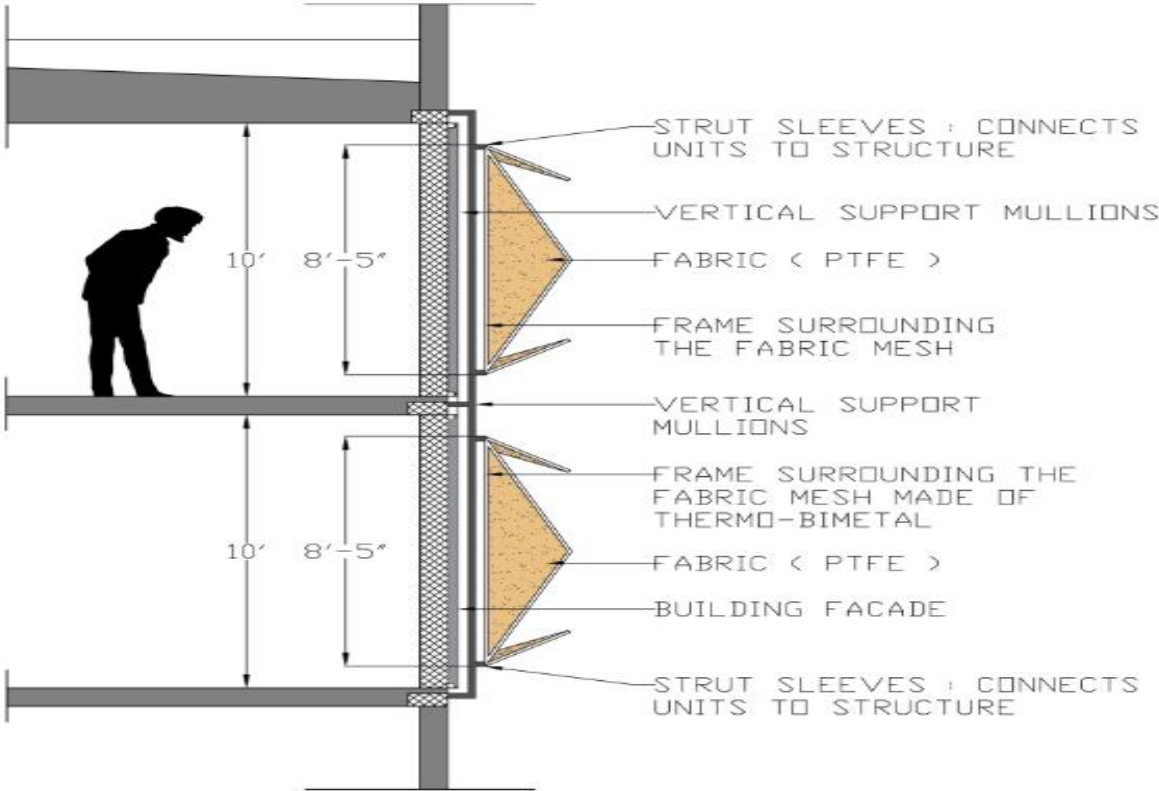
SECTION VIEW OF THE FACADE ATTACHMENT TO THE BUILDING
